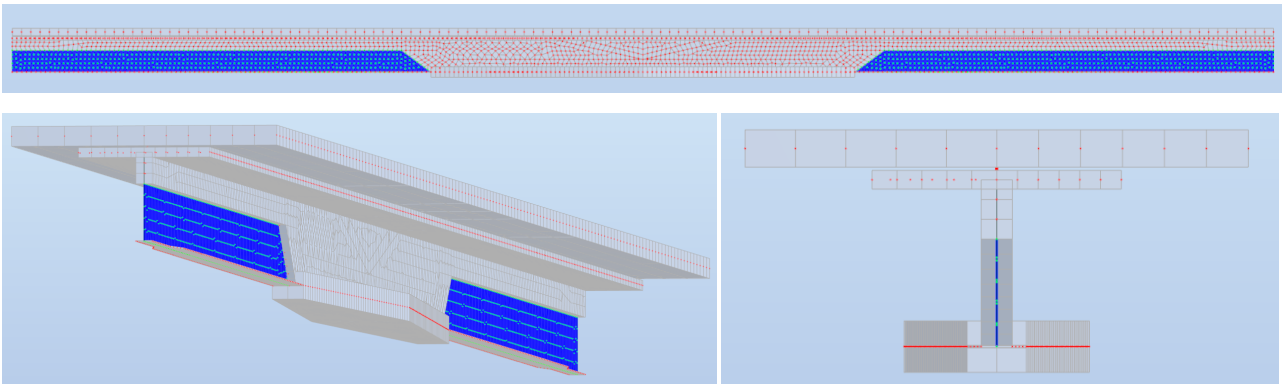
Side view, 3d view and cross section of a finite element model of the considered beam (steel web highlighted in blue).
